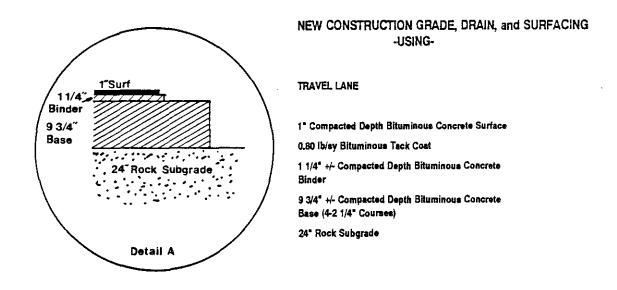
Typical Section and Detail for Main Line Section of KY 645.
